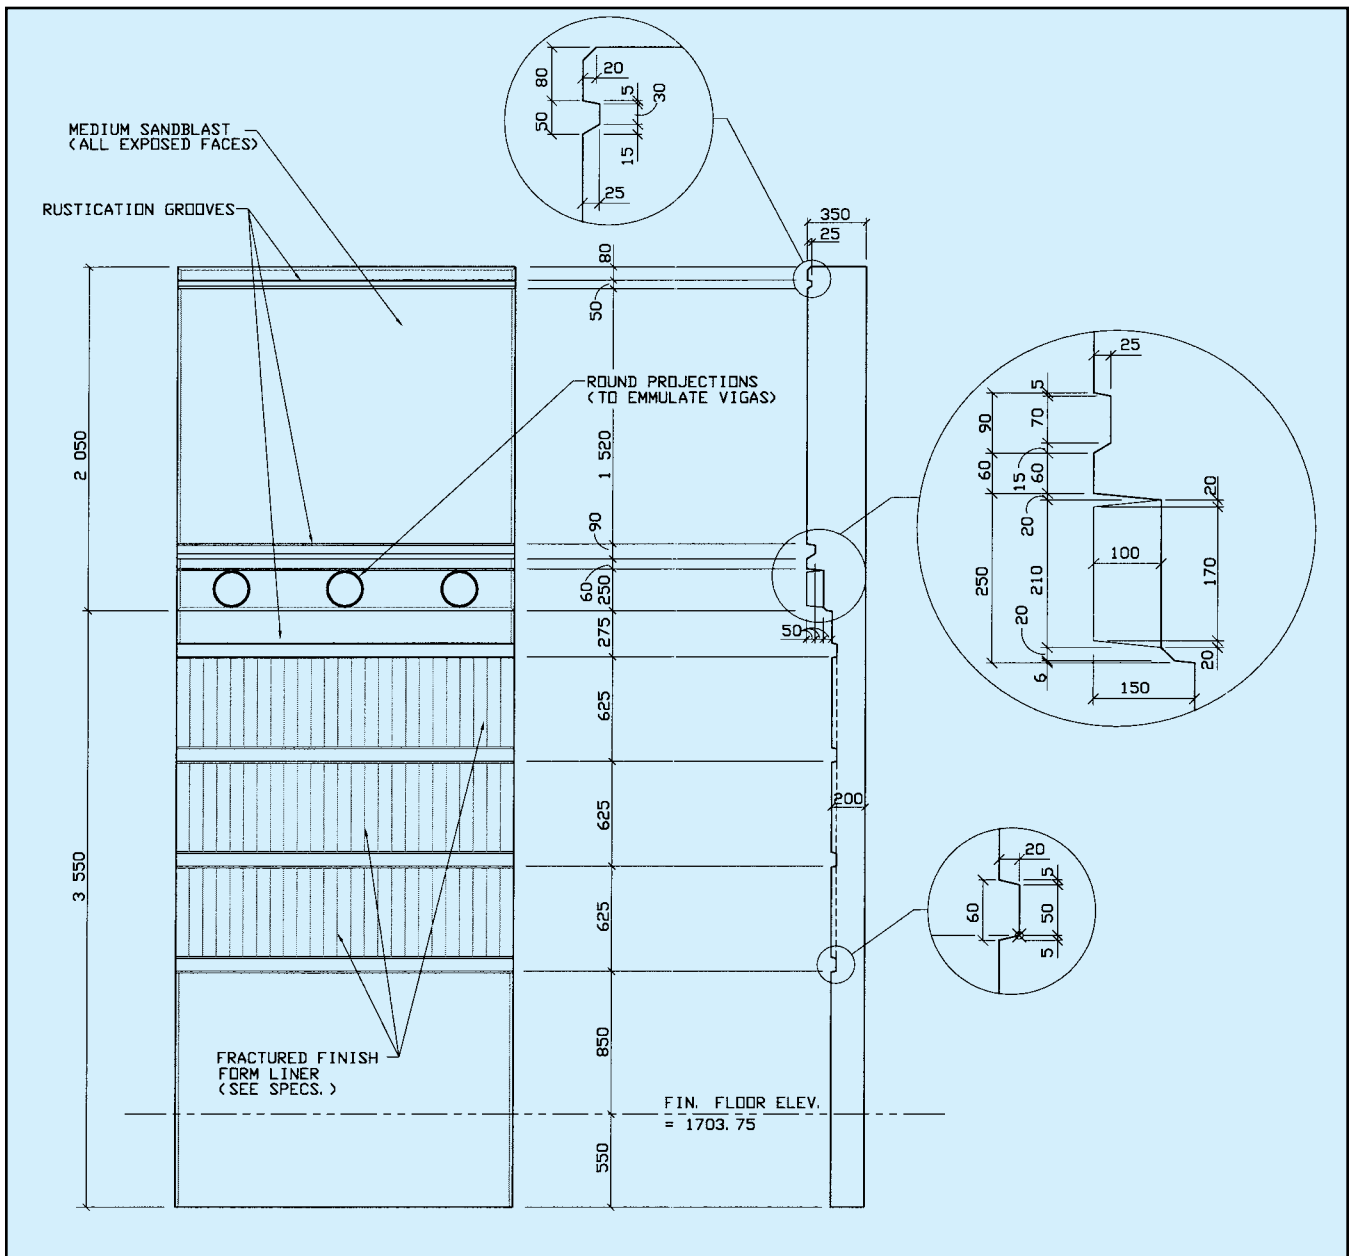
Wall panel detail showing vigas and fascia that were created to add interest.
